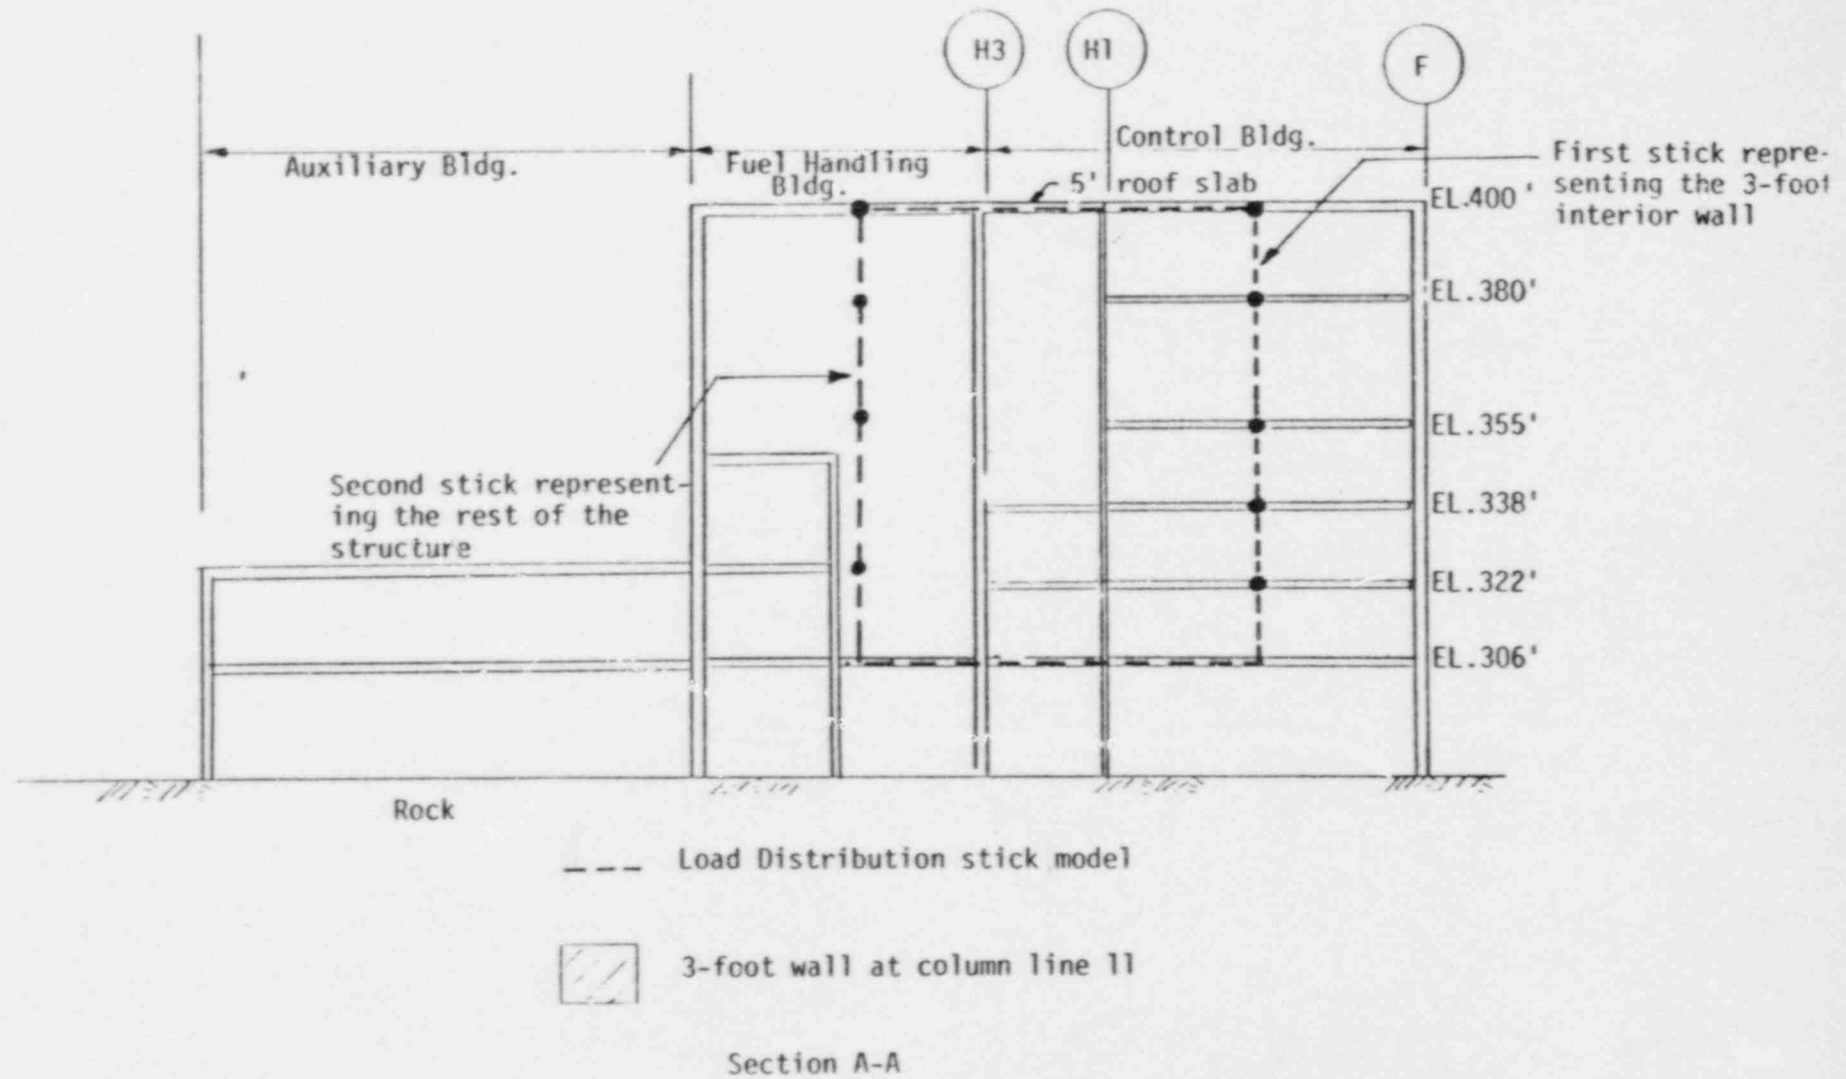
CONTROL BUILDING LOAD DISTRIBUTION MODEL
